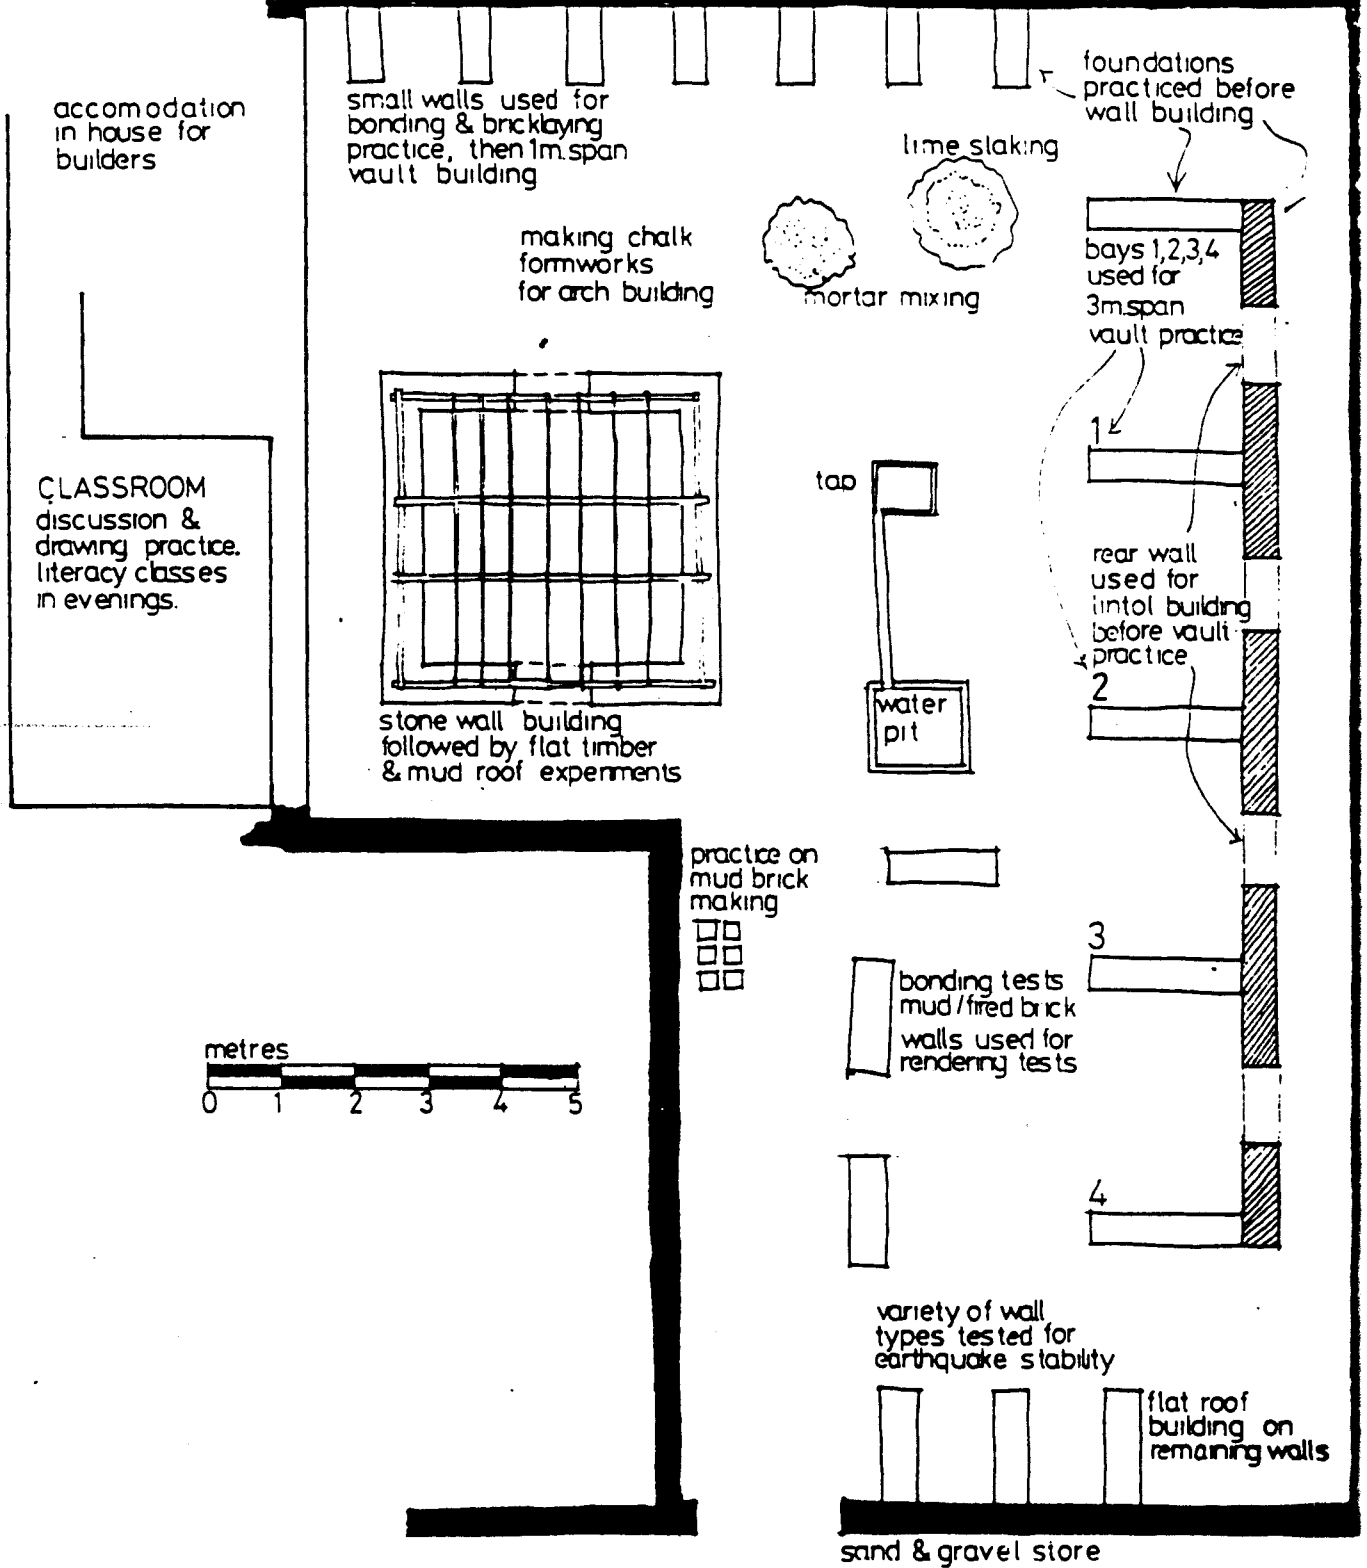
LAYOUT OF BUILDERS' WORKSHOP
